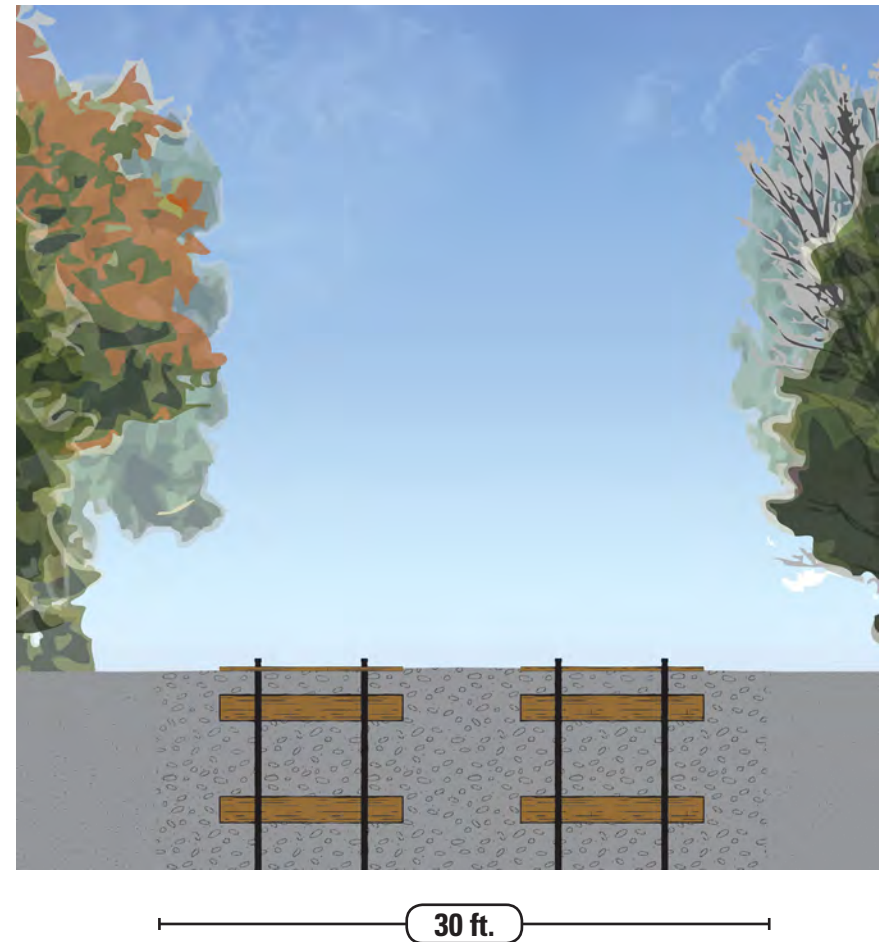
| Elwyn to Wawa Service Restoration Construction Package R3-2 - Milepost 16.7 to 18.5 (detail of cross section 253+50)
